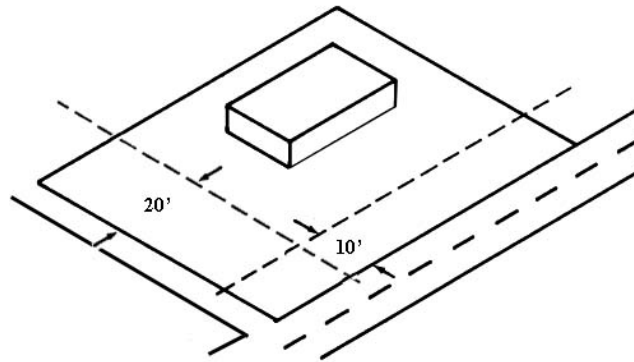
Setback requirements for signs for large floor area structures.
